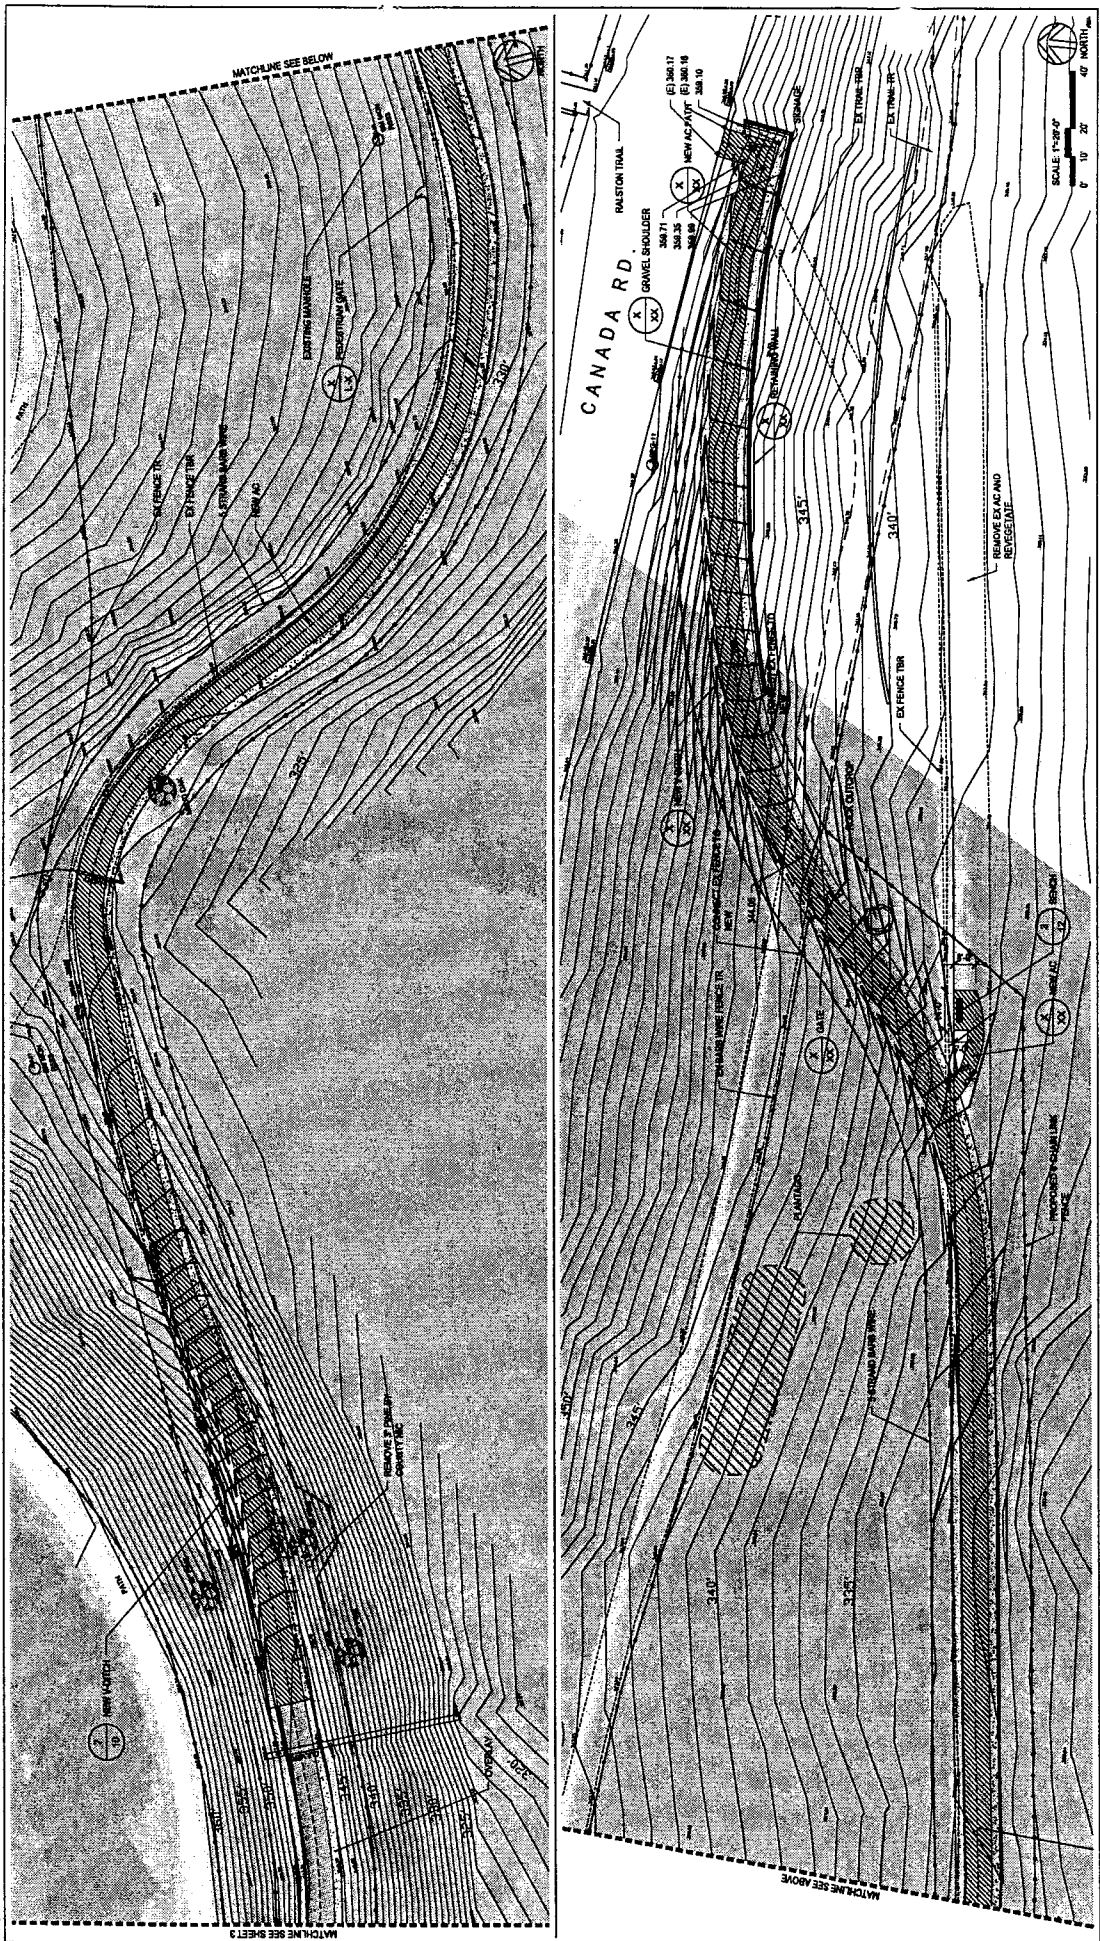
Sheet 5 of the Trail Construction Drawing Set
